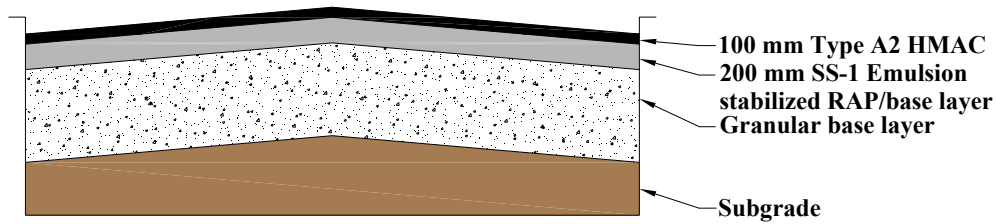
Typical cross section without drainage system on 8th Street passing and median lane
